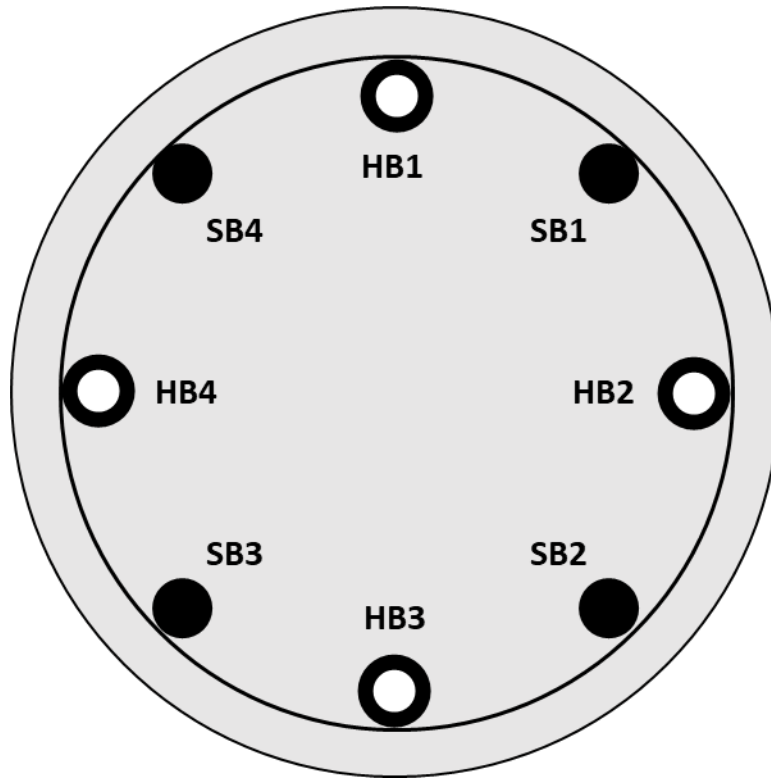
Schematic diagram of vertical reinforcement bar labeling convention, looking down from the top of the pile
